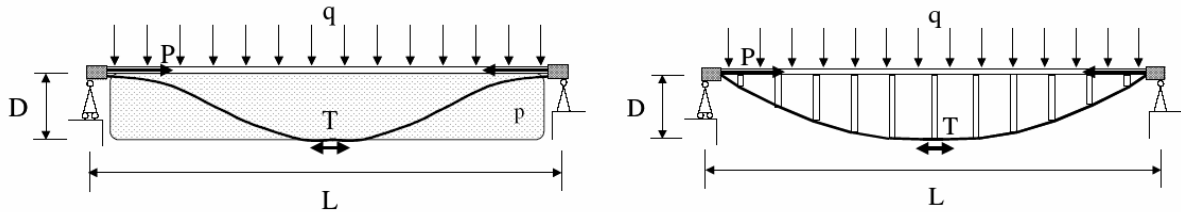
Tensairity girder (left) compared to a truss girder (right). Basically, the vertical struts of the truss are replaced by an airbeam in the Tensairity structure with important consequences.
